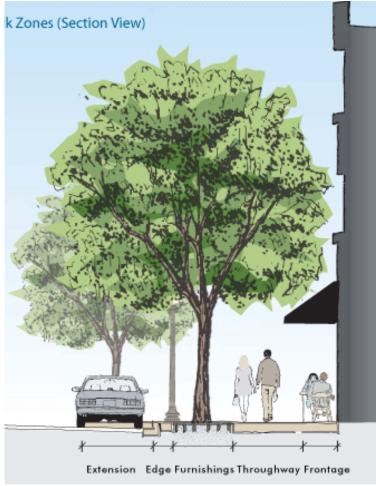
Sidewalk Zone - from sfbetterstreets.org
